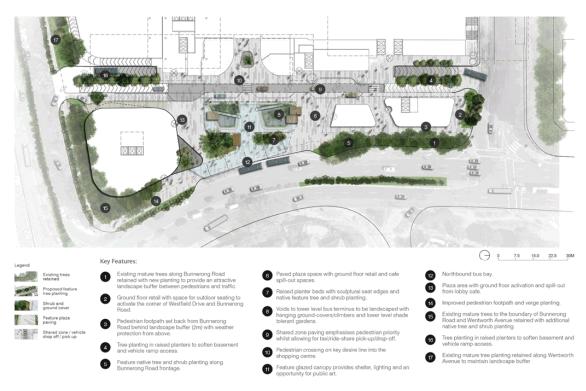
Landscape and publicly accessible areas public domain plan indicative FUTURE PLAN – should Buildings D and E be developed in the future
